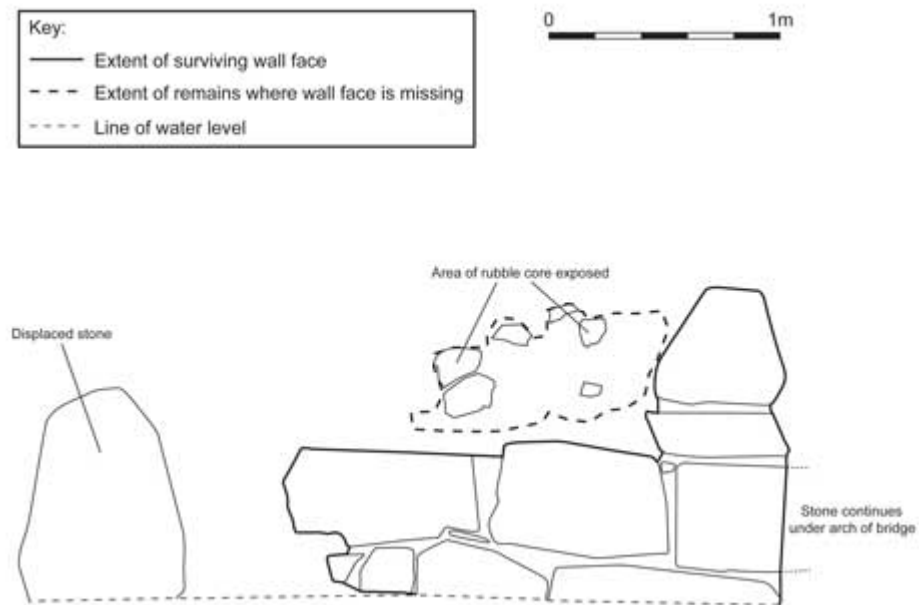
; Structure 3, Rusticated Bridge #1 (Upper Bridge): Elevation c
